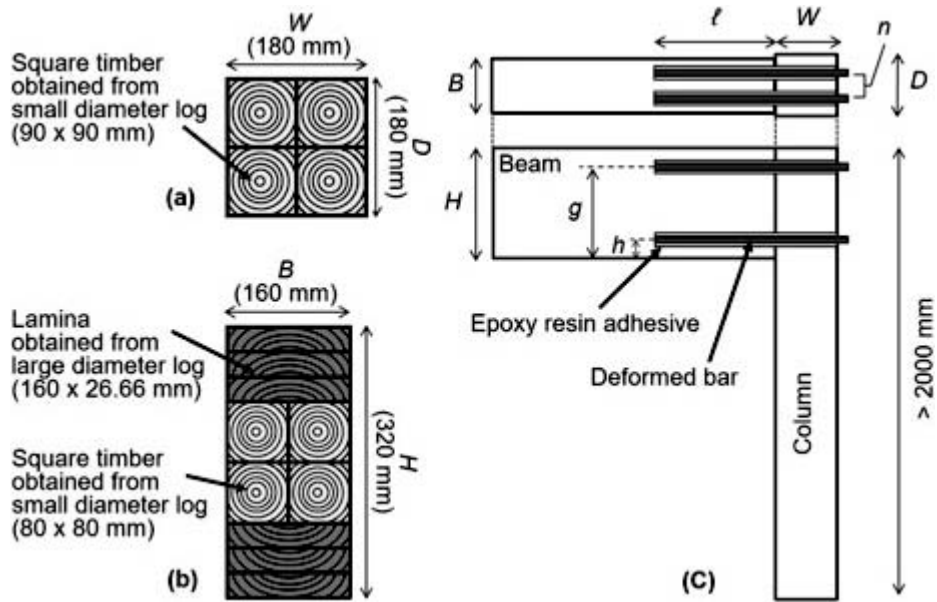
Beam-column joint with glued-in steel rods: (a) cross-sectional structure of laminated column, (b) cross-sectional structure of laminated beam, and (c) joint specimen.
